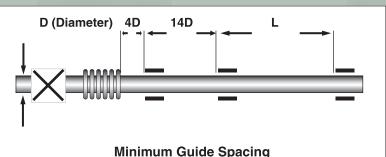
Guide Spacing Ft. Steel Pipe Guide Spacing
